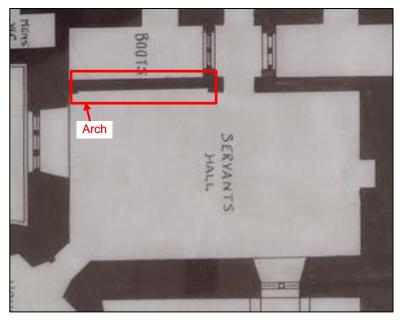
Extract from the 1909 plan of the building, first floor of Cell G
